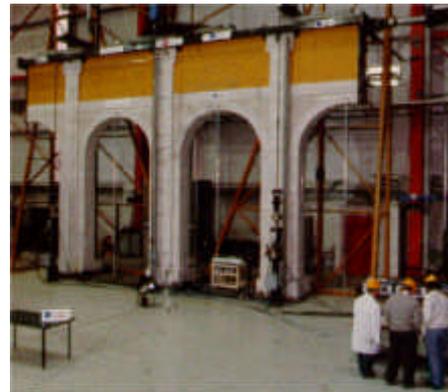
Façade full-scale model in the ELSA reaction wall laboratory
